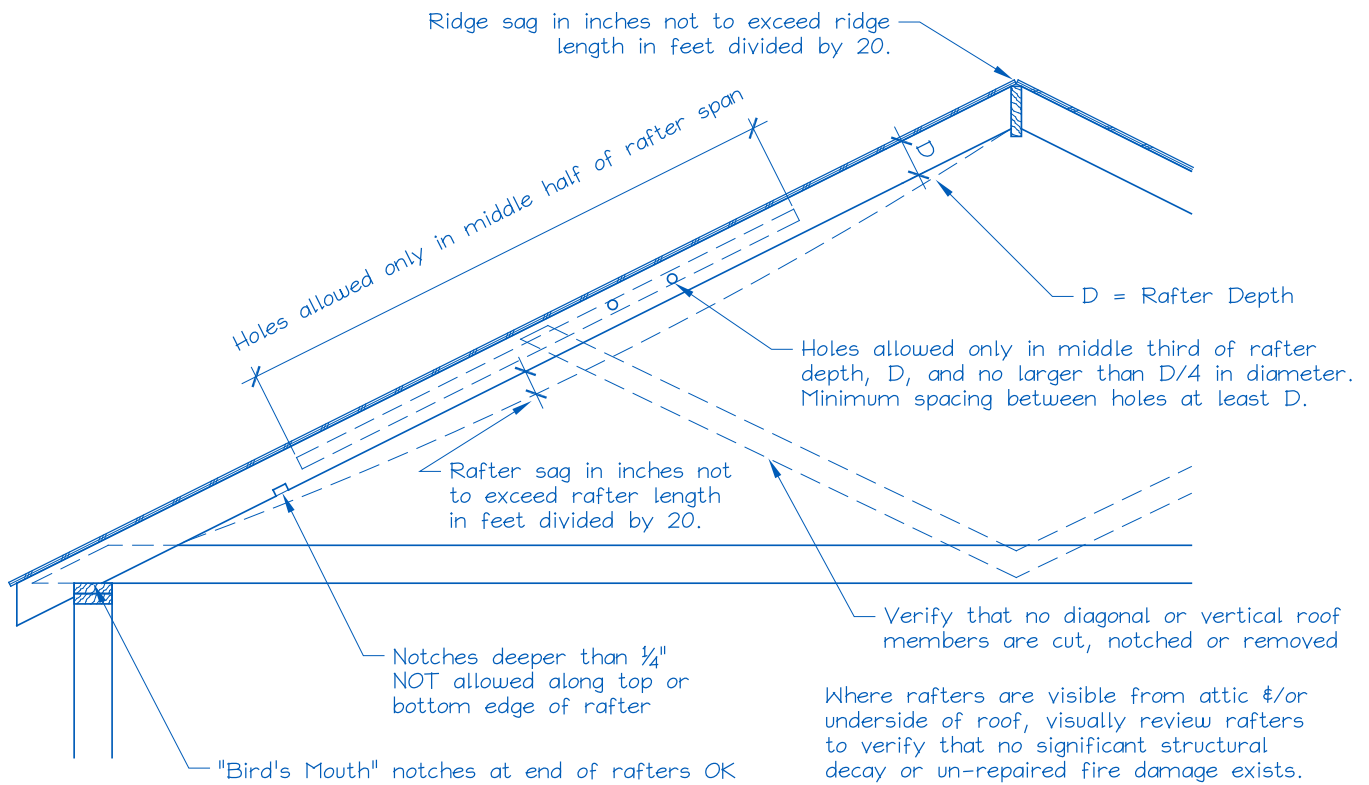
Roof Visual Structural Review (Contractor's Site Audit) of Existing Conditions.
